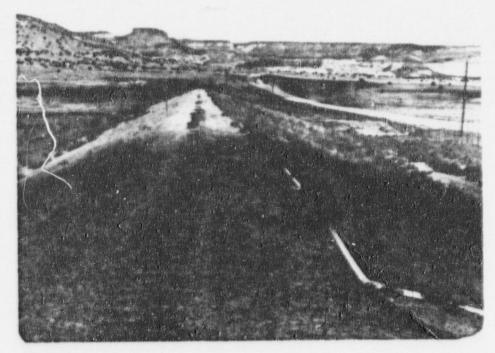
VIEW OF CREST AND DOWNSTREAM SLOPE OF SADDLE DAM, LOOKING FROM SOUTH TO NORTH.
